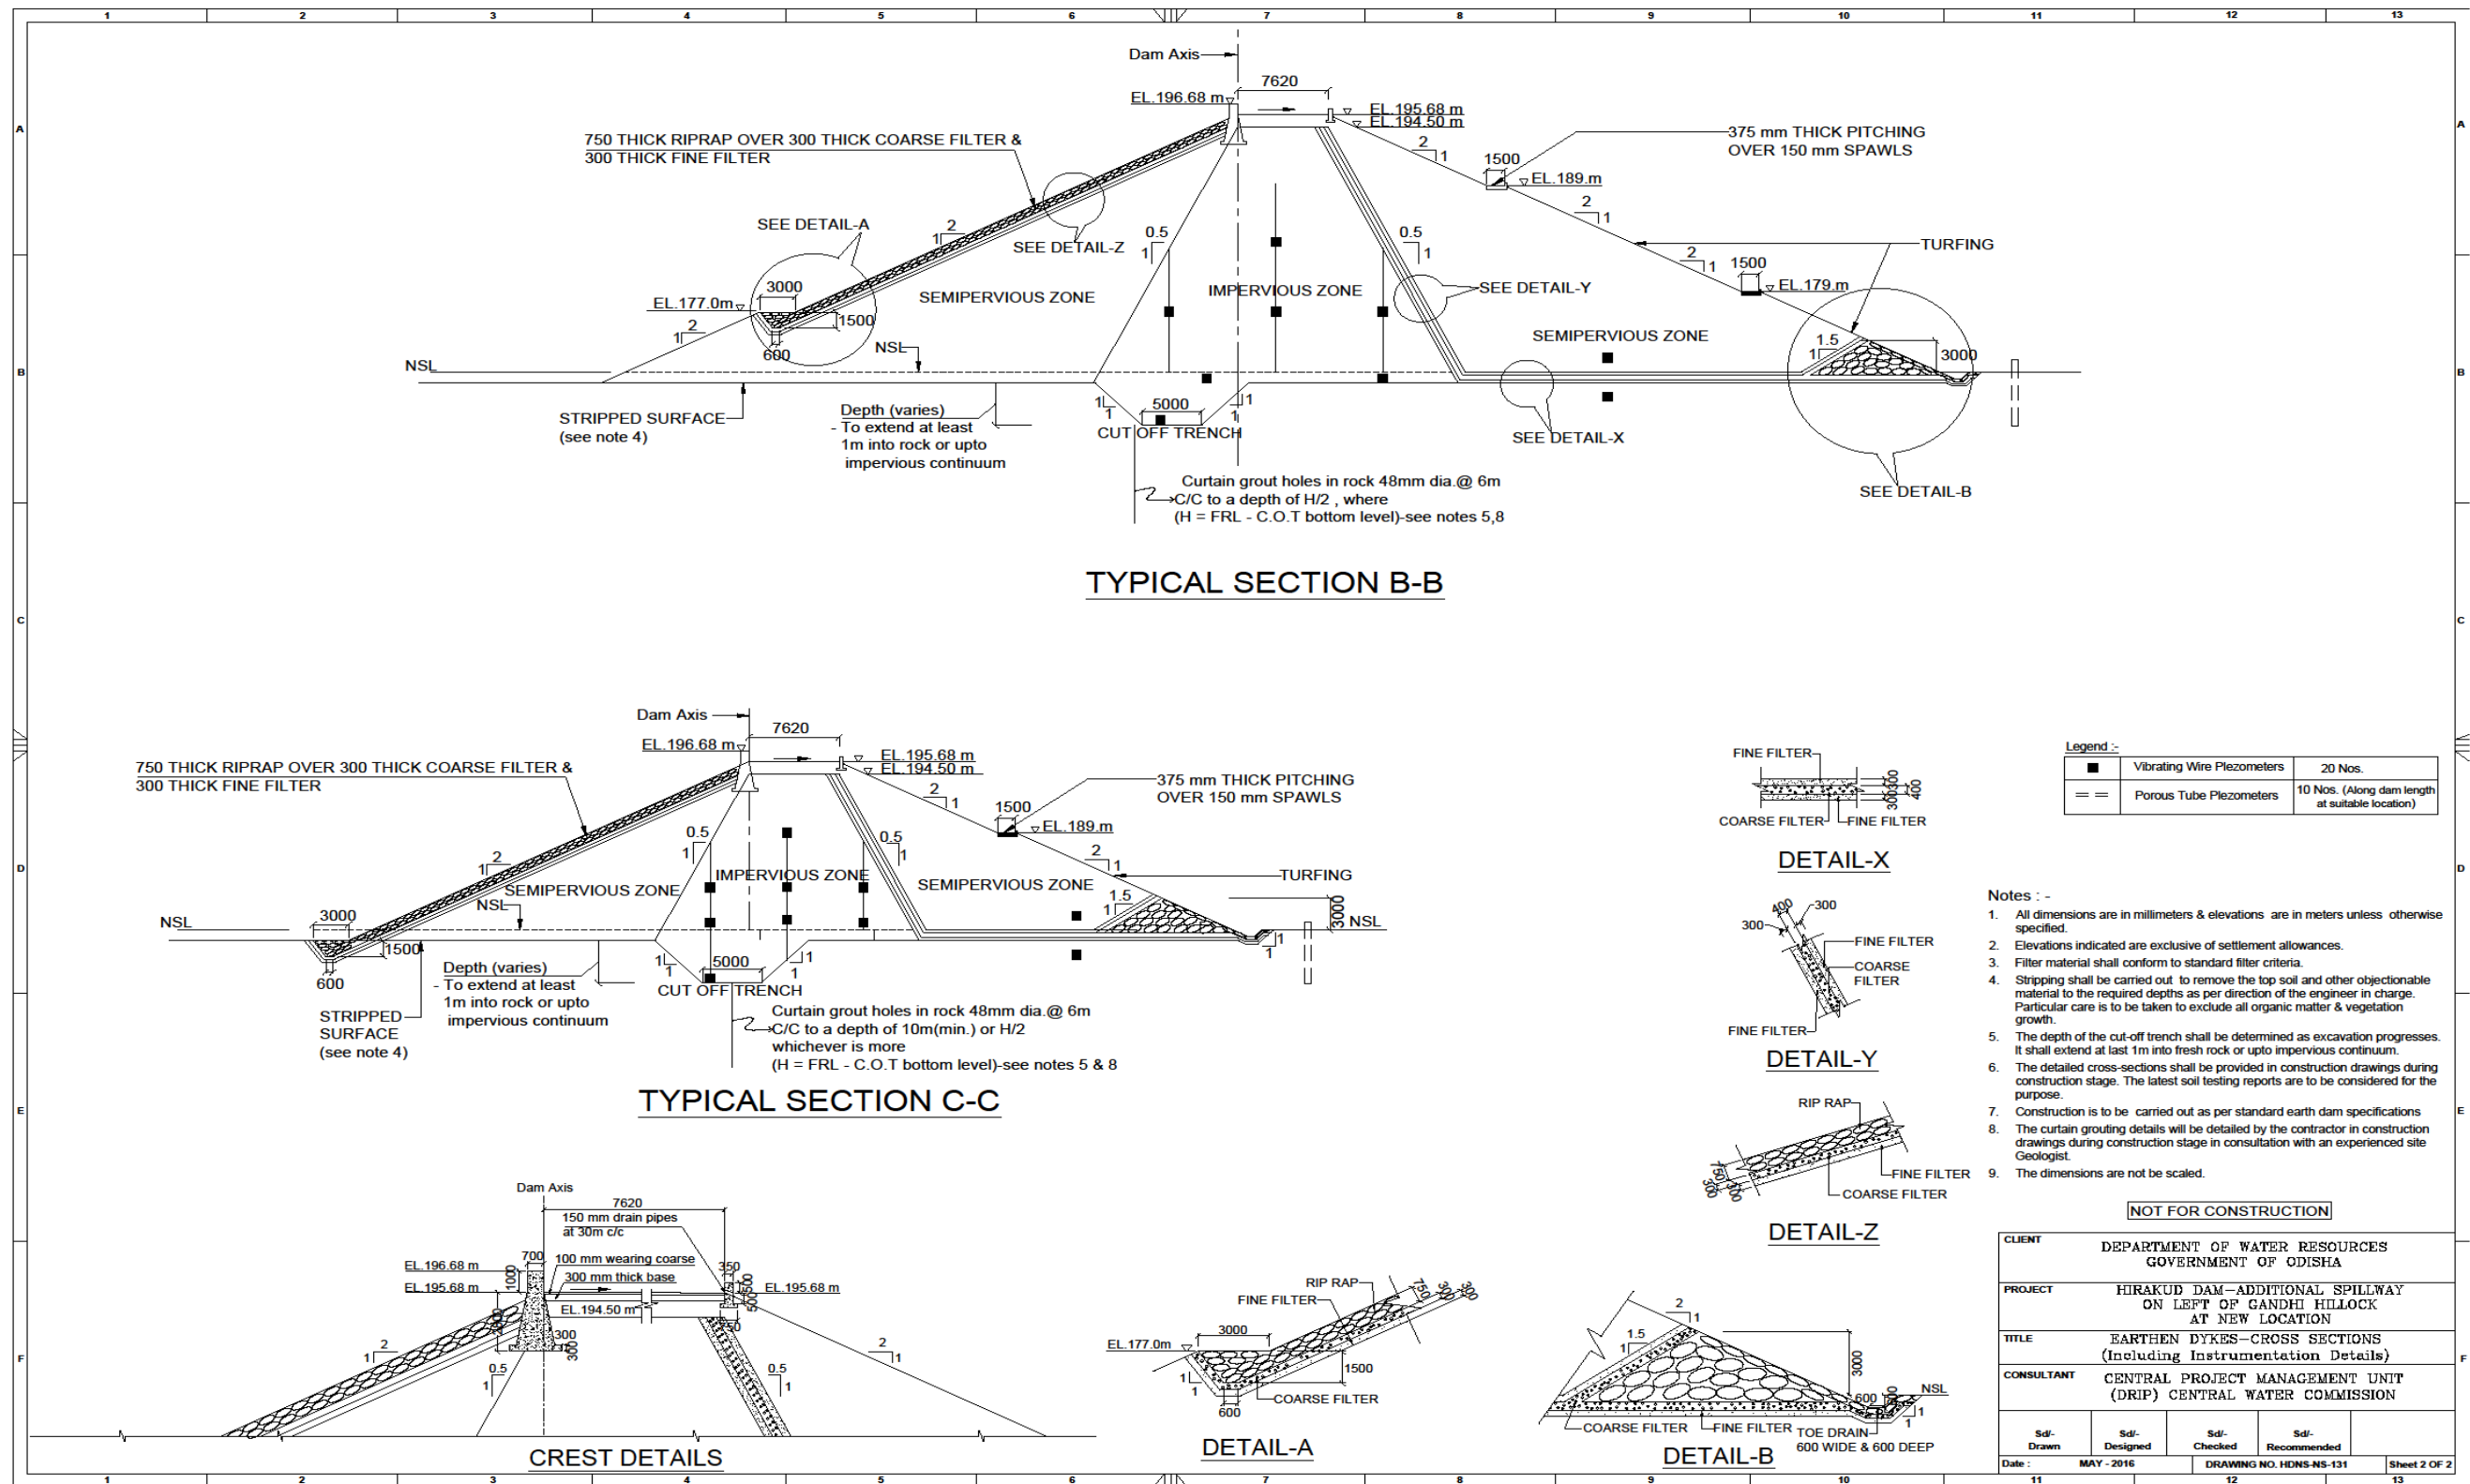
Cross Section of Earthen Dyke at B-B and C-C
